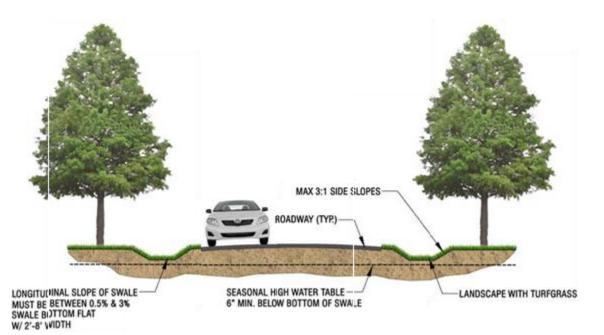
Cross-Section View of a Grassed Swale System
